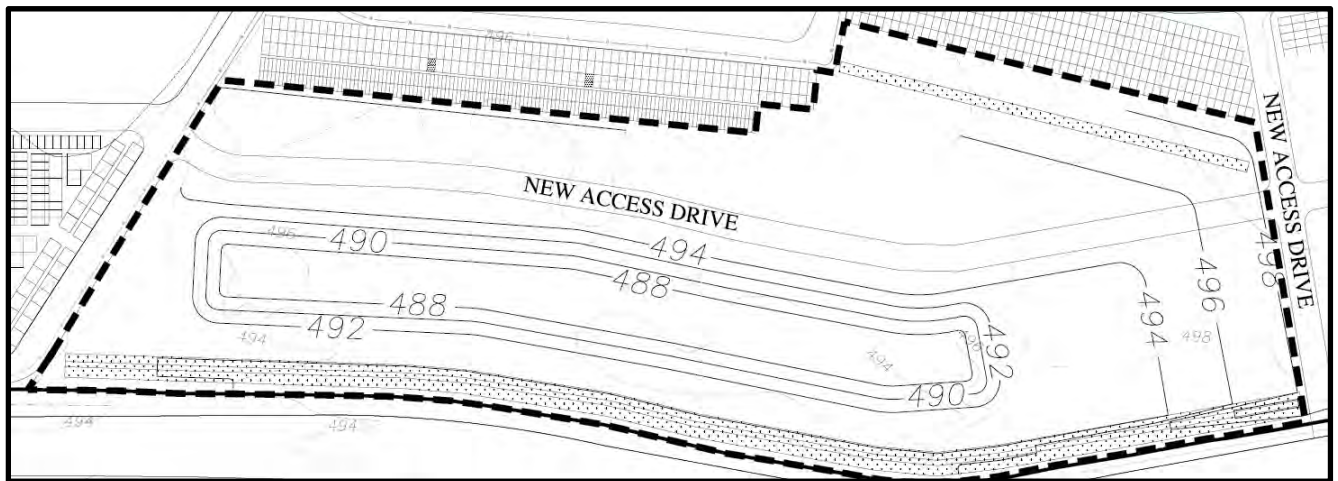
Expansion Areas 3 & 4 Proposed Grading Plan
